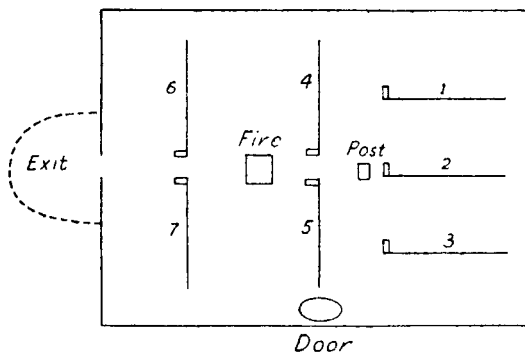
Plan of sleeping places in Yurok sweat house.
